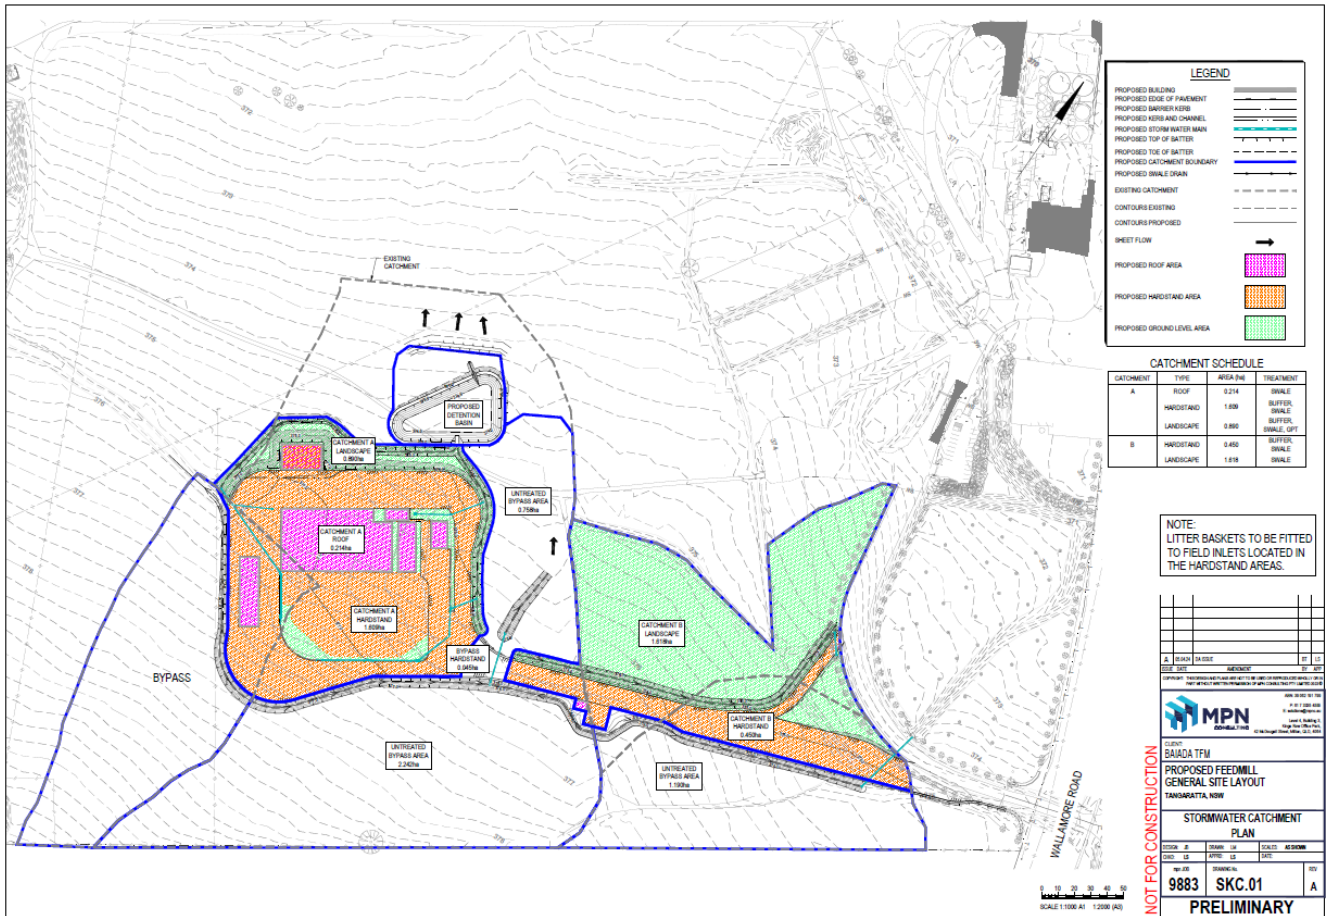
Proposed Site Catchments (MPN Consulting, 2024)
